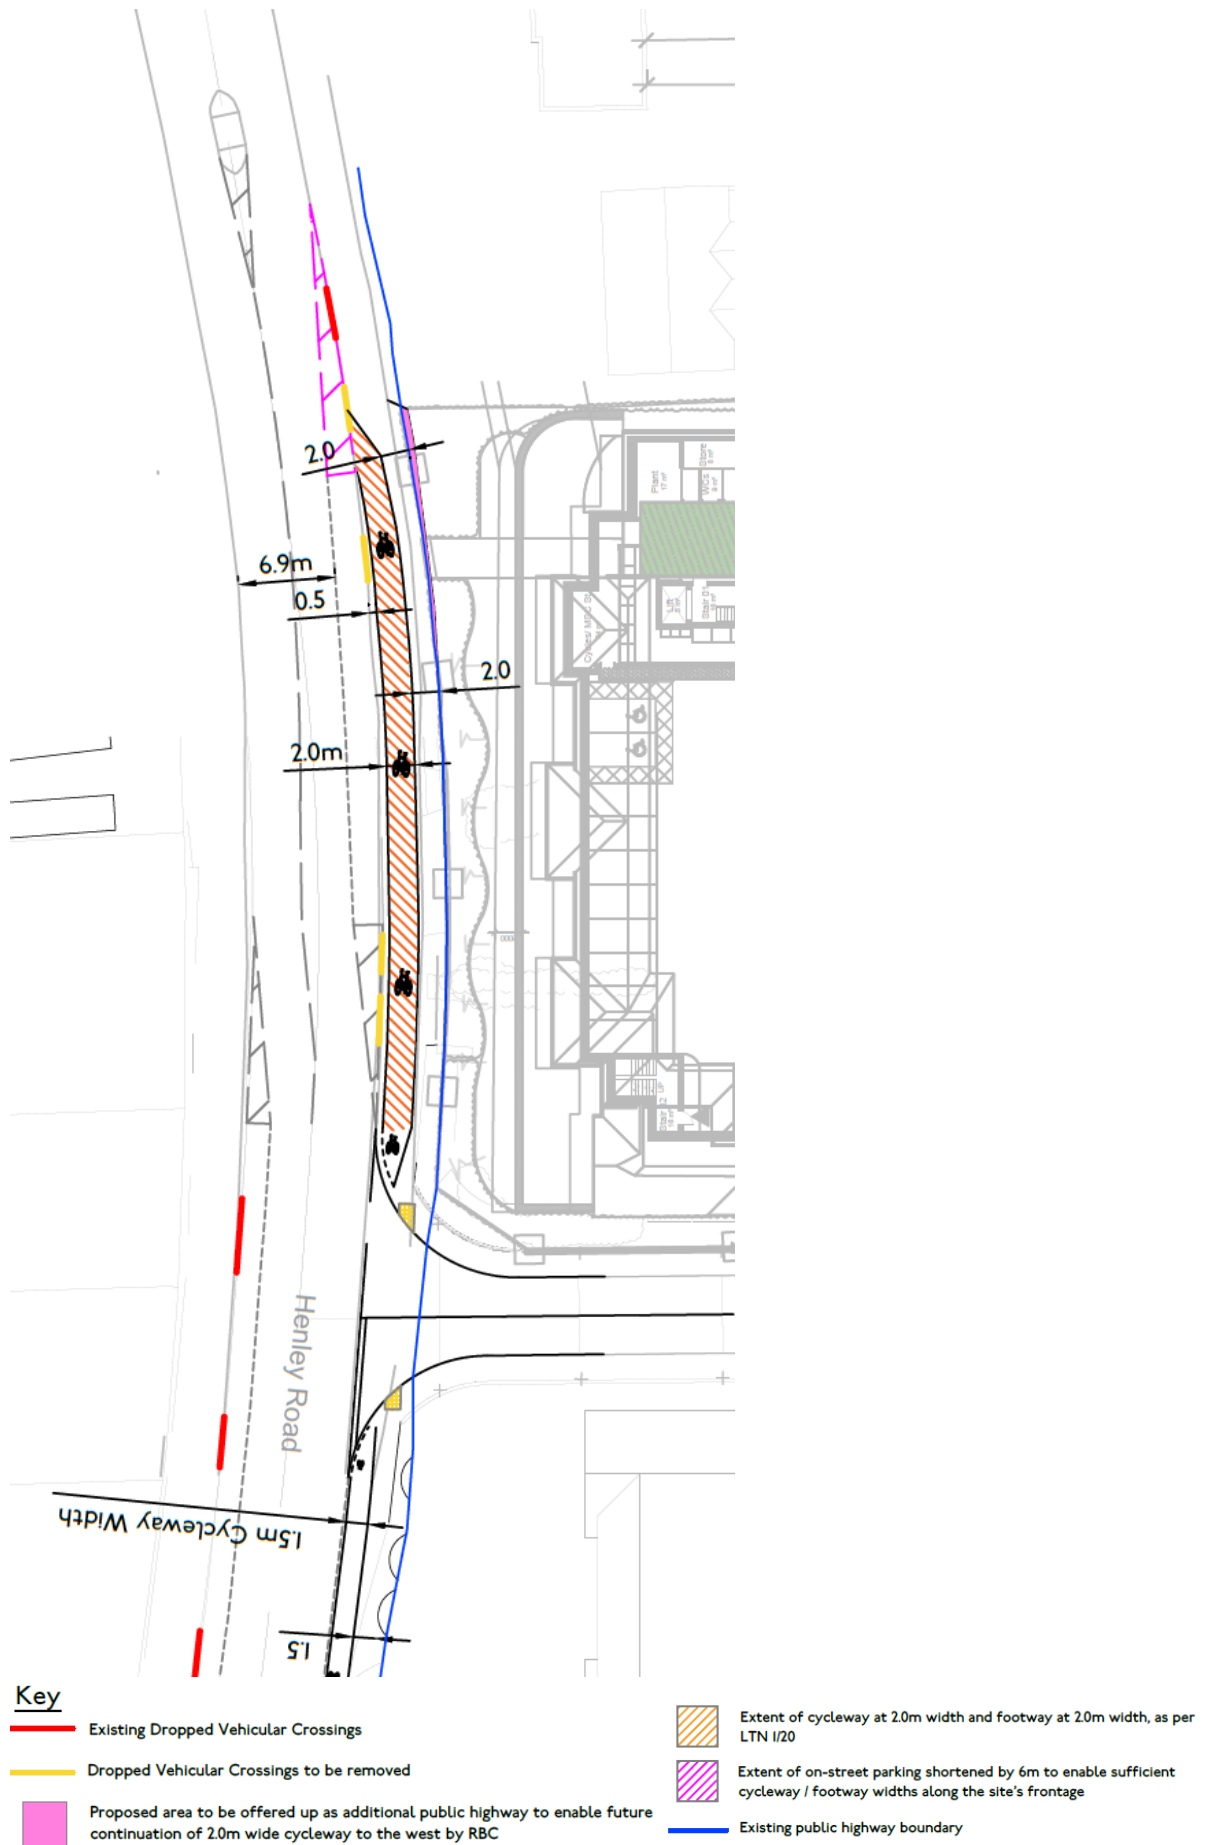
Proposed footway/cycleway on Henley Road (extract of J32-5410-SK-011)
